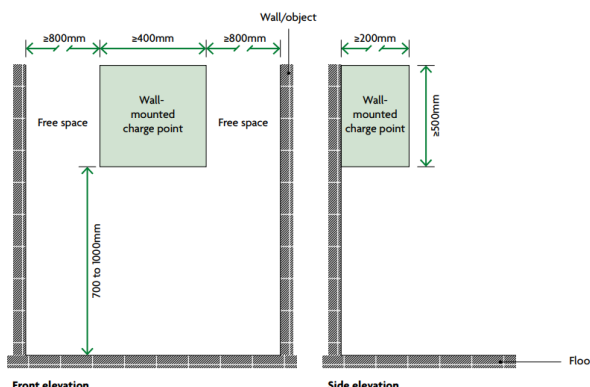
Minimum space requirements for wall-mounted charge point location (source: Gov.uk¹)
